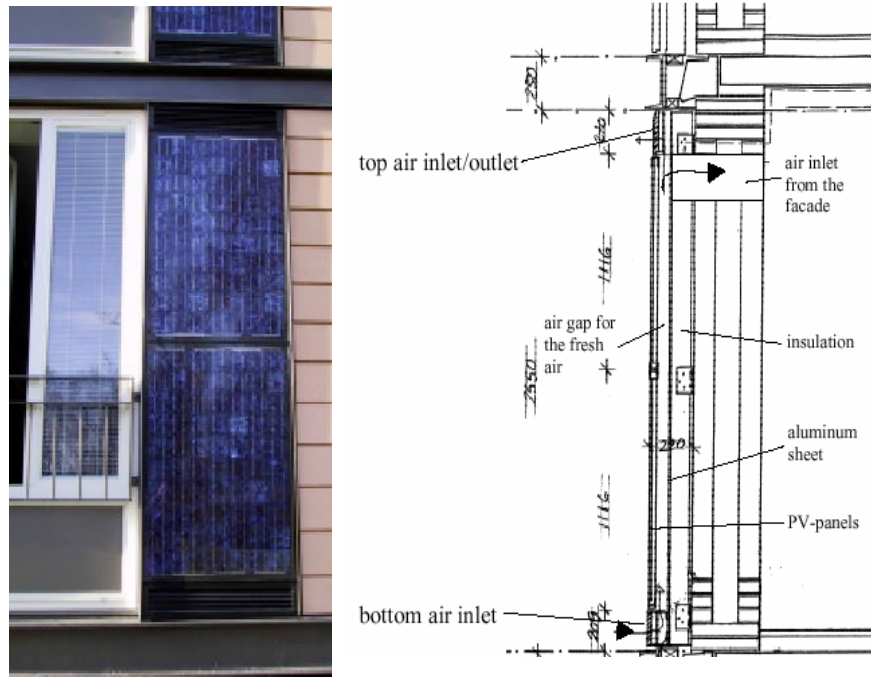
Left: Picture of a PVT air facade element, integrated on a residential multifamily building, Lundeberg (DK) Right: Principle sketch of the PVT air panel at Lundeberg. (Østergaard 2001)
